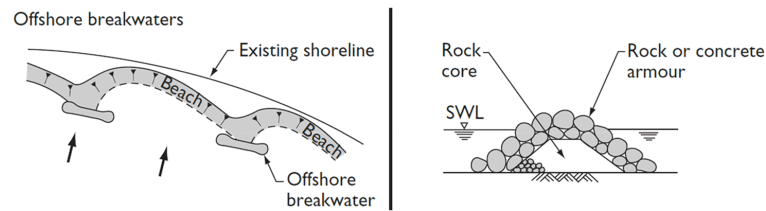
Typical plan view and cross section illustrating a detached breakwater system.
